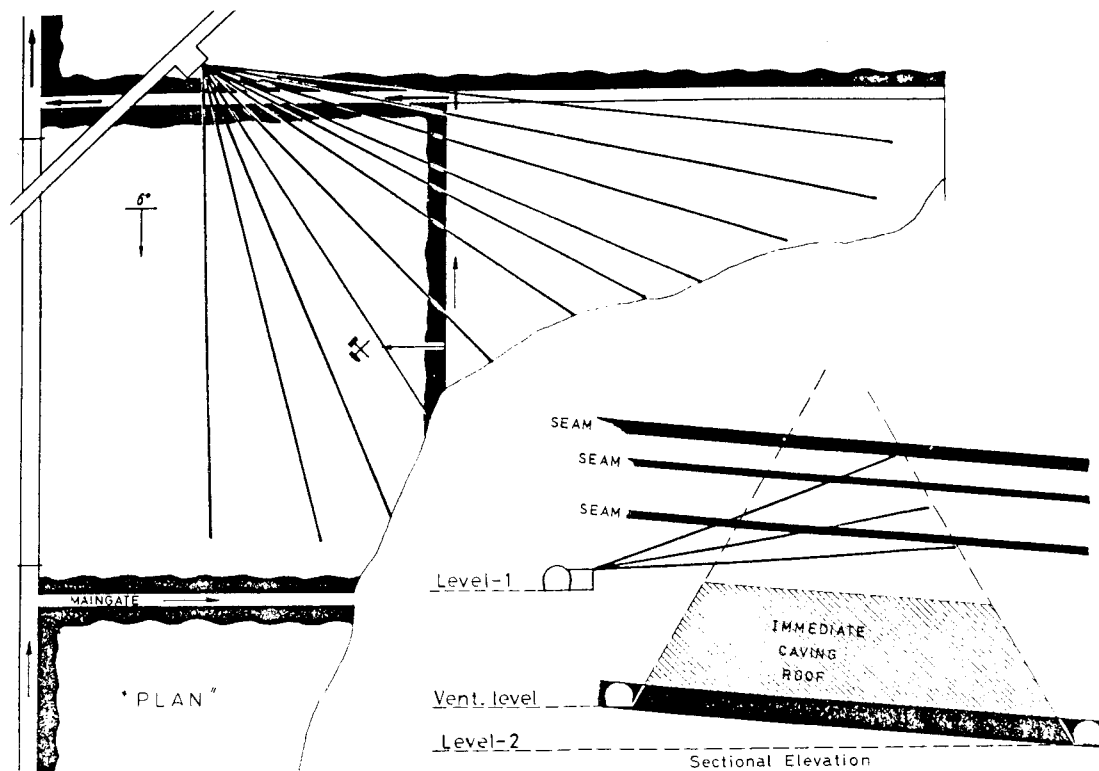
Retreating longwalls drained through boreholes from roadways in adjoining strata (Schmidt, 1981)
